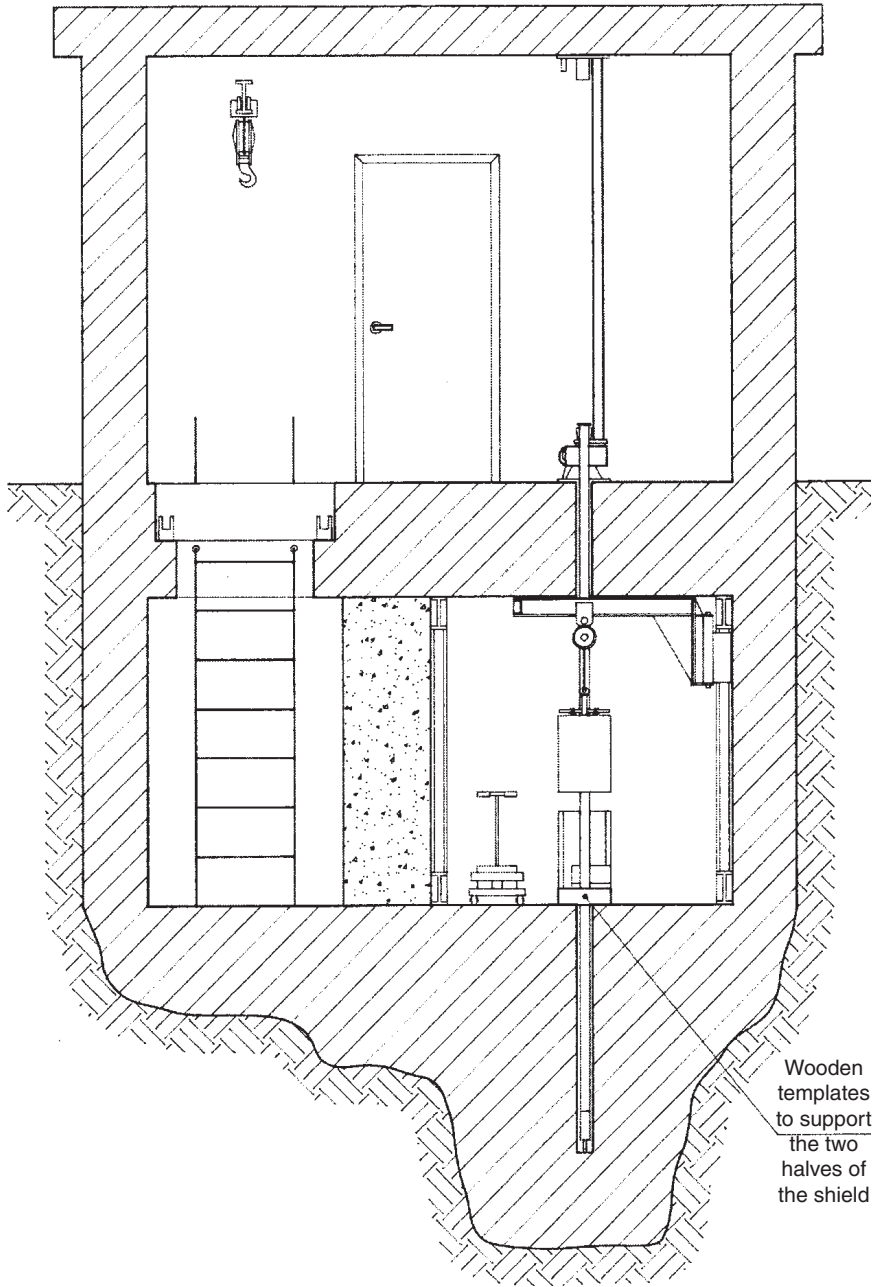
Initial situation. Ground floor and underground bunker; cross-section.
